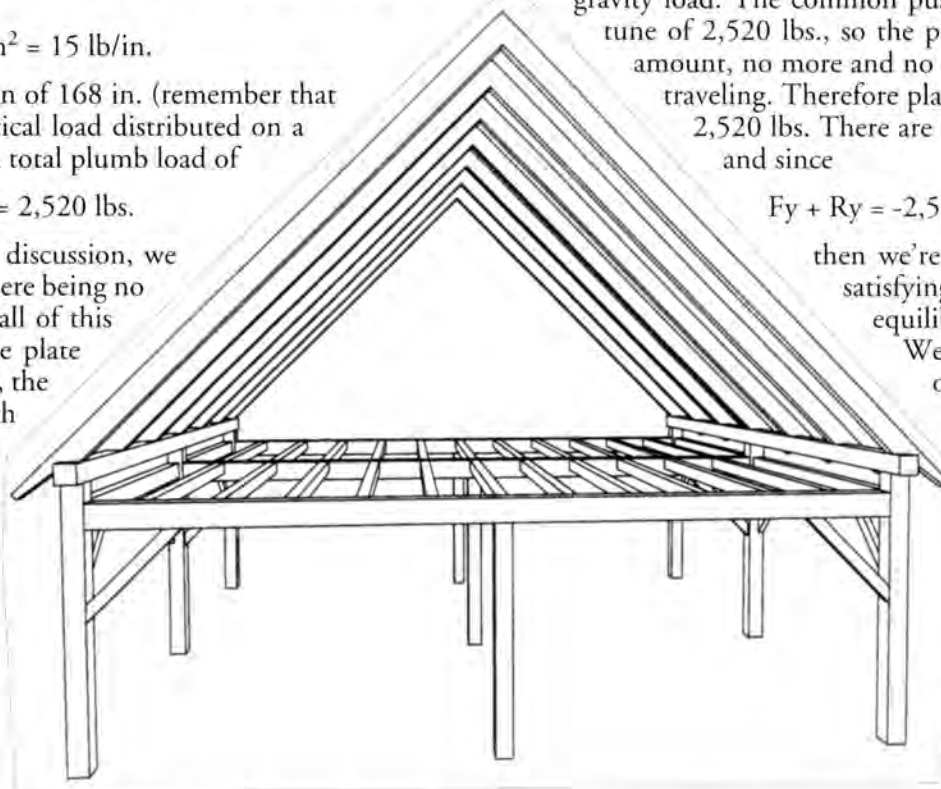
MODEL HOUSE FRAME. RAFTER RUN (HALF-SPAN) IS 14 FT.
